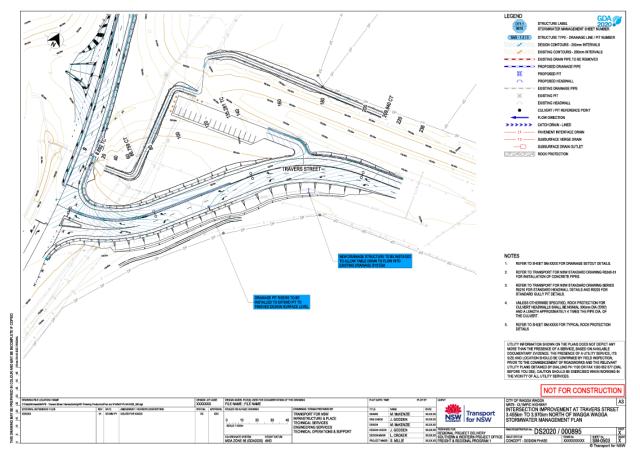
Drawing of Proposed Upgrades for Travers Street Intersection (TfNSW, 2021b)
